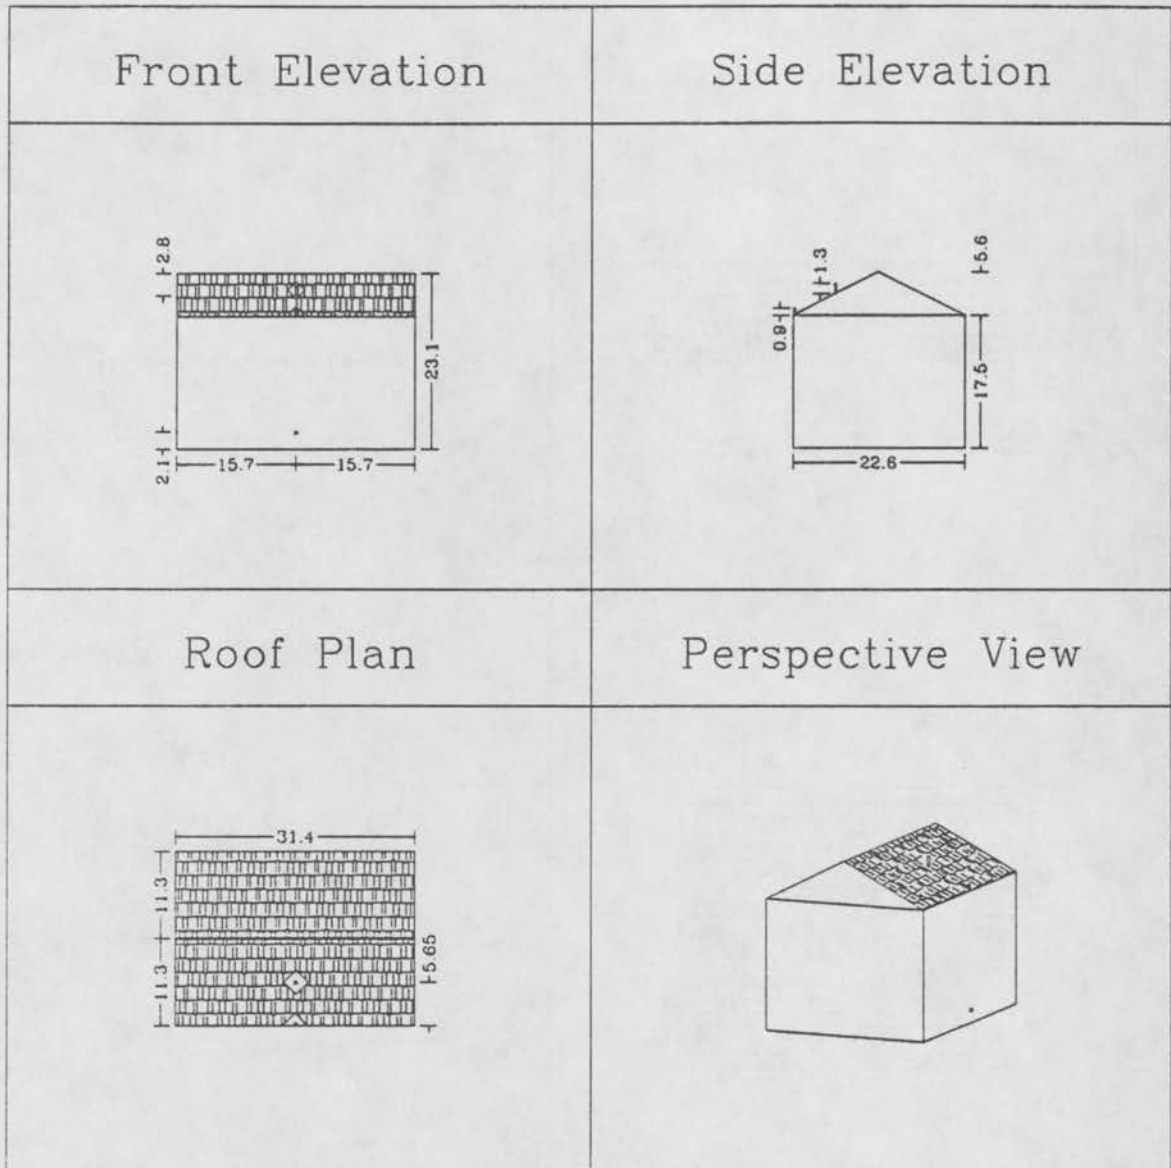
One Story House with 9:12 Roof Slope Dimensional Drawing
